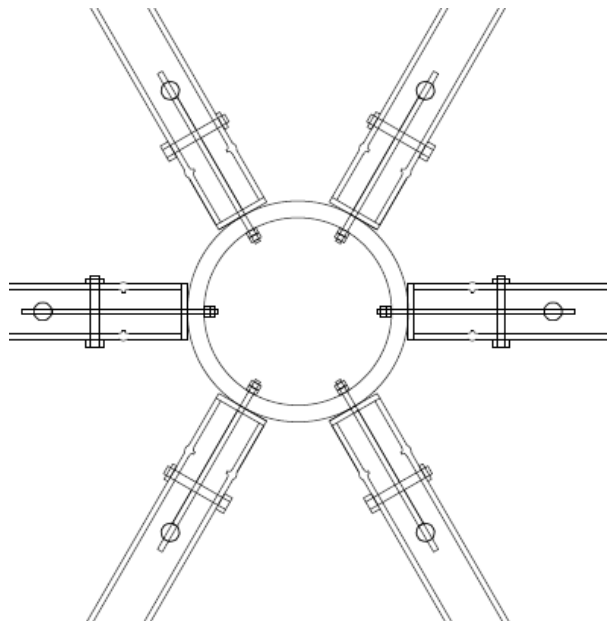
Bamboo round cross dowel joints connected to dome hub
